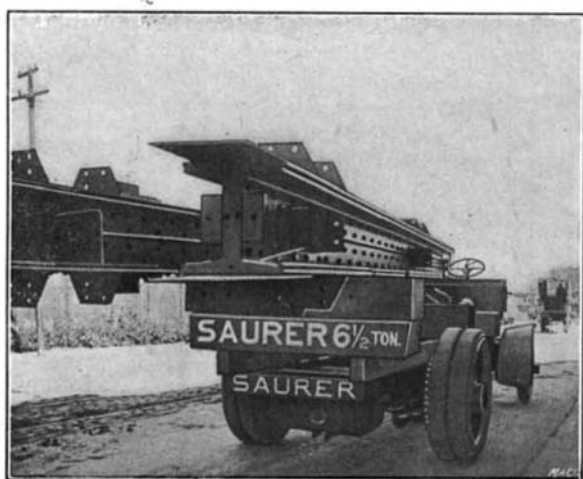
A Six and One Half Ton Truck Hauling Steel Girders for an Office Building Construction.
